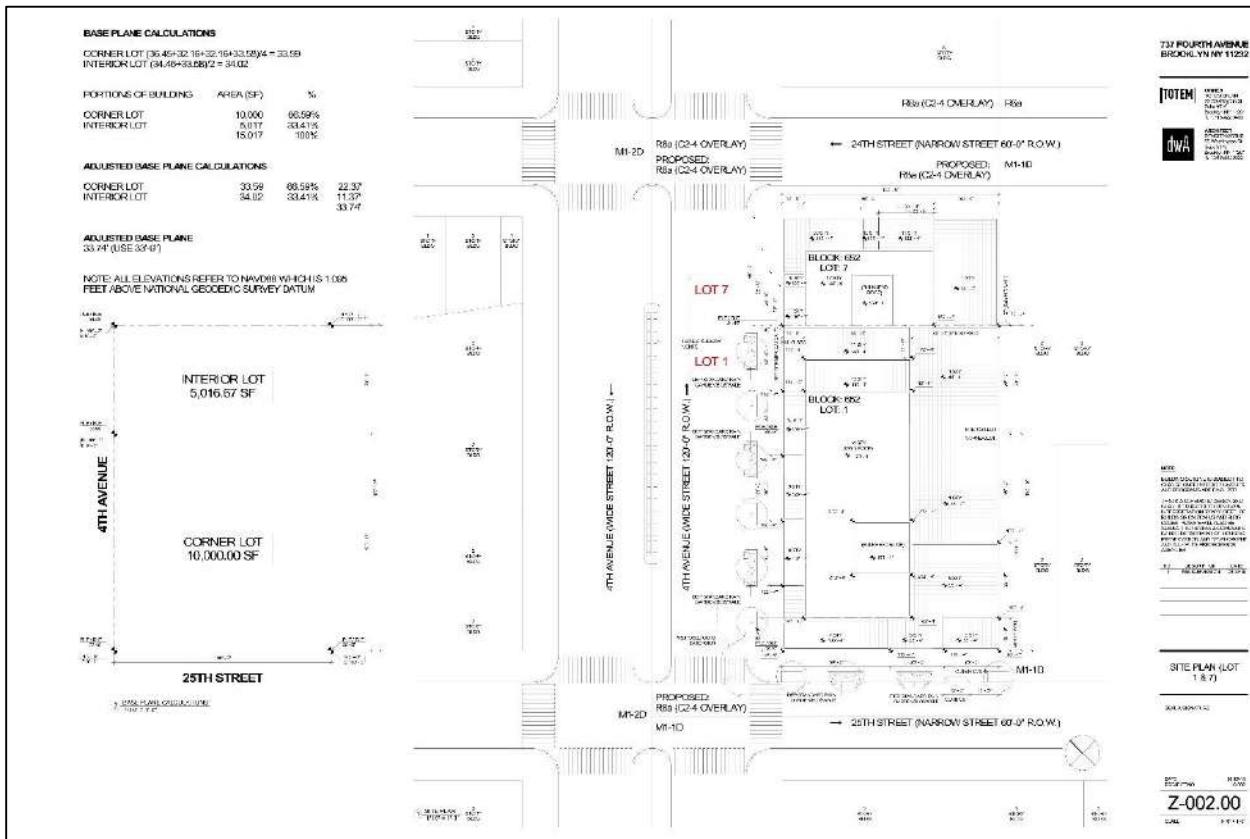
Projected Development Sites 1 and 2 Building Configuration DesignFigure F-4: Projected Development Site 1 with Surrounding Buildings in Google Coordinates
